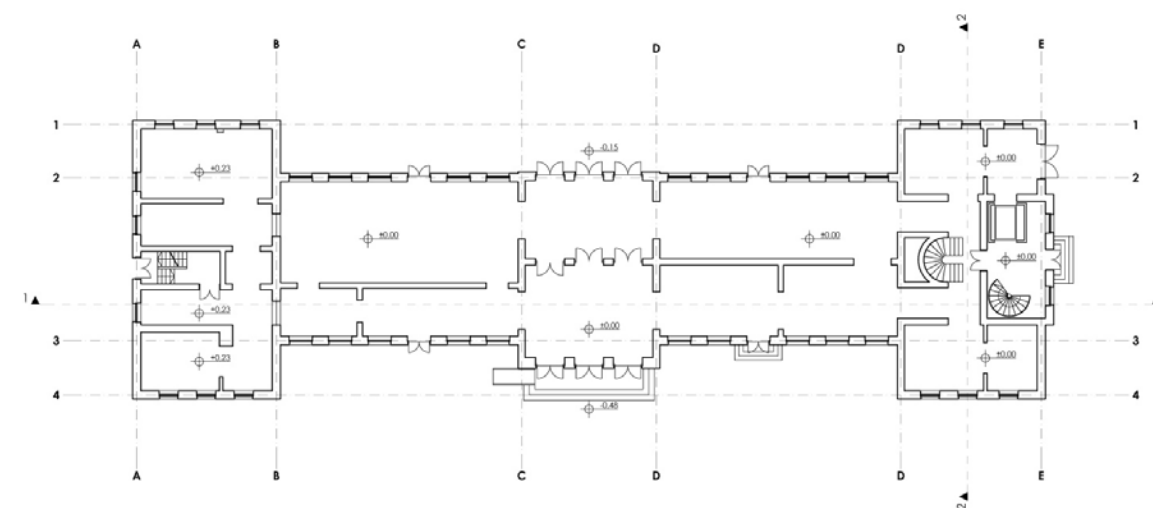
Railway station "Banja Luka City"; ground floor plan.
